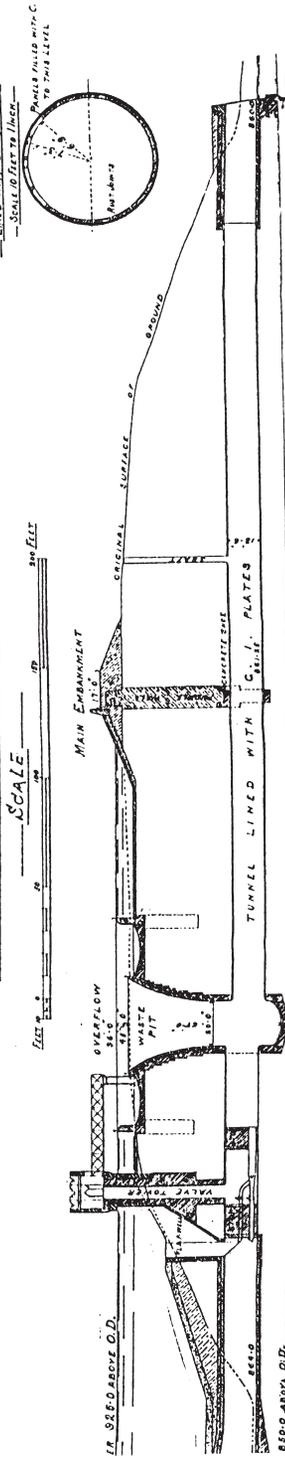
Section of Blackton Reservoir embankment showing the bell-mouth overflow; designed by James Mansergh. [Author]
